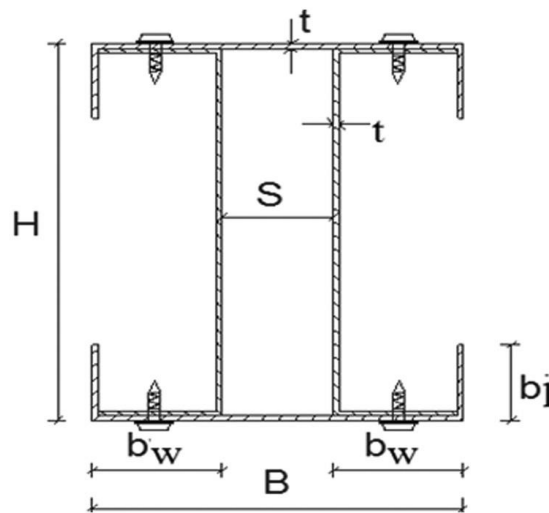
Typical built-up column details (Anbarasu and Venkatesan, 2019).
